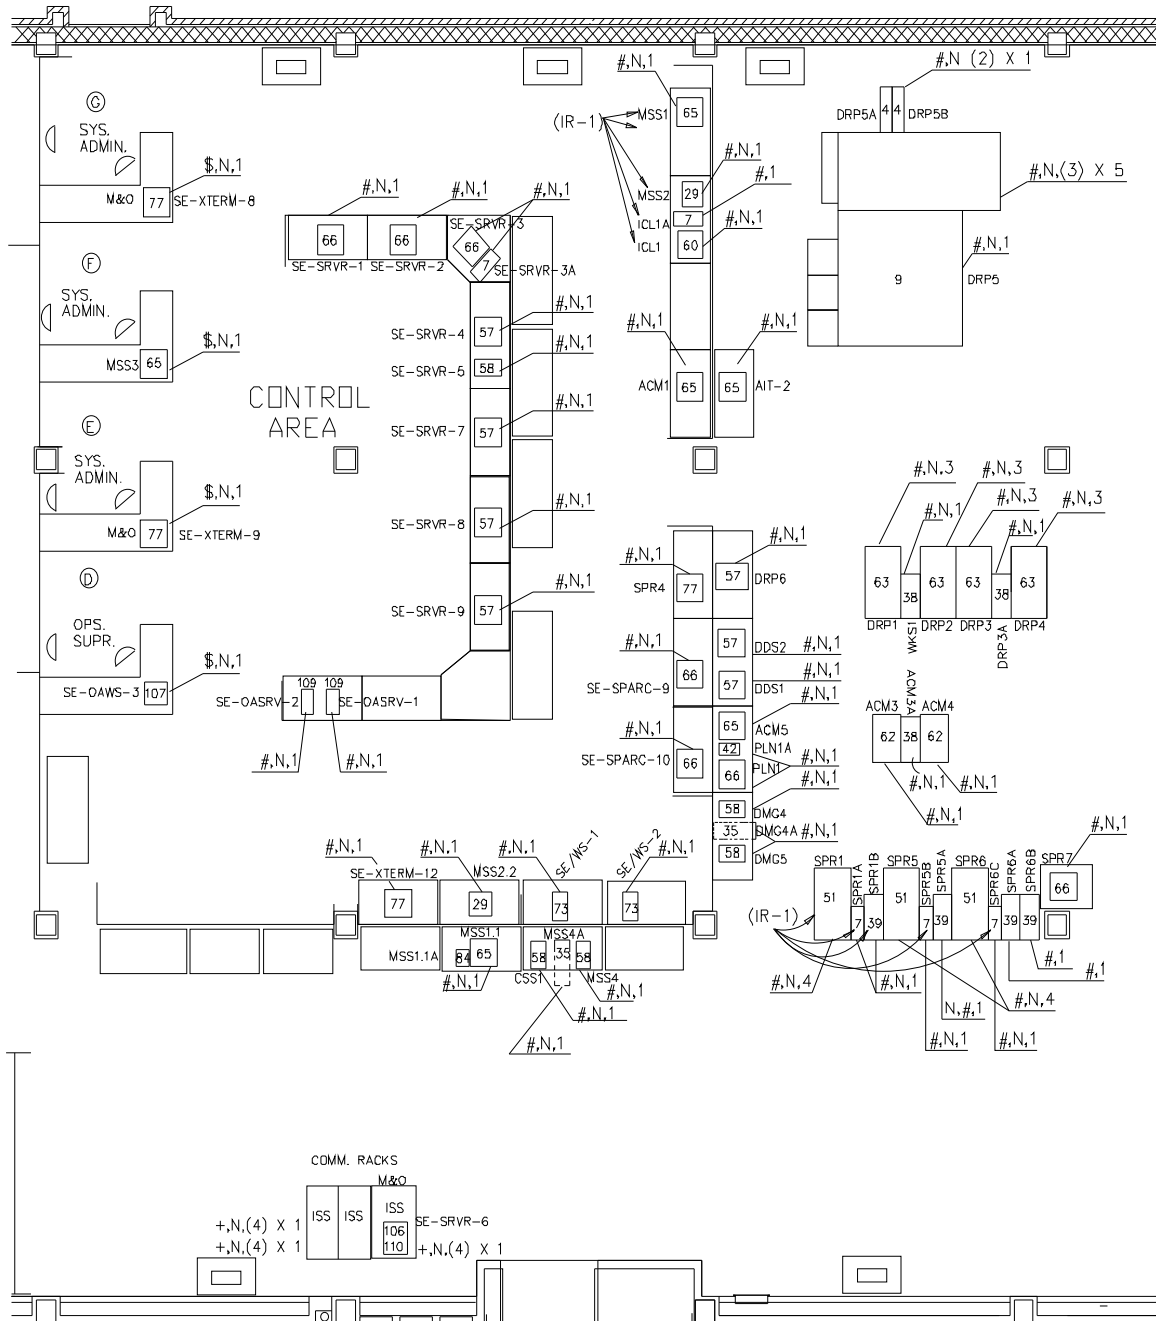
Floor Plan for LaRC (Ops Area)
